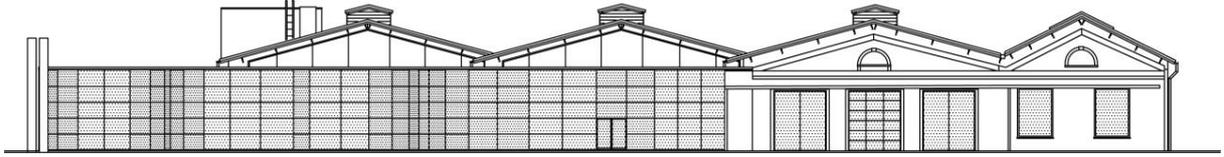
Rear facade of CerModern, hangar building on the right, atelier 3, and the glass wall covering other two ateliers. (Source: Uygur Mimarlık Archive)
